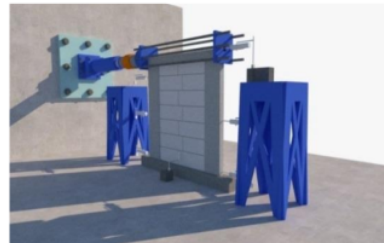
Setting up of RC frame infilled with prefabricated plain foamed concrete blocks specimen
